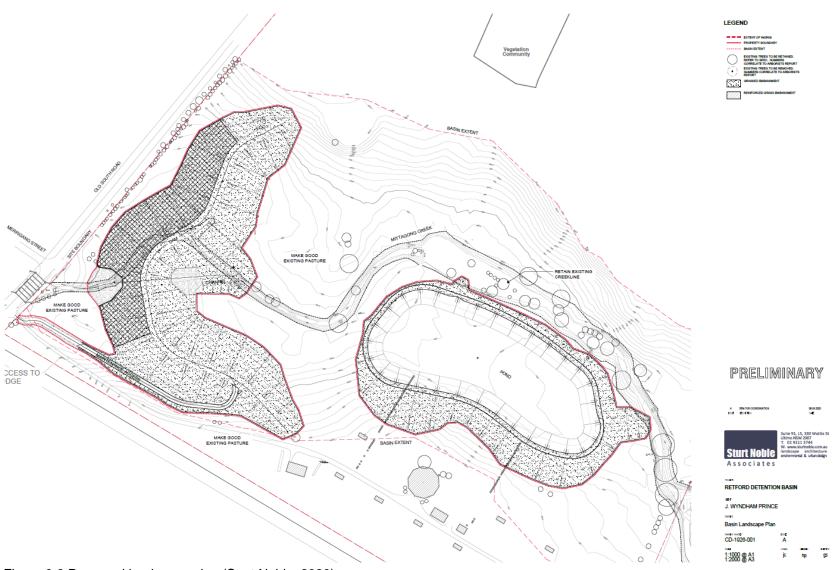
Proposed landscape plan (Sturt Noble, 2020)
